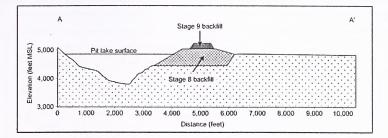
Stage 9 Cross Section A to A' through Pipeline/South Pipeline Open Pit
